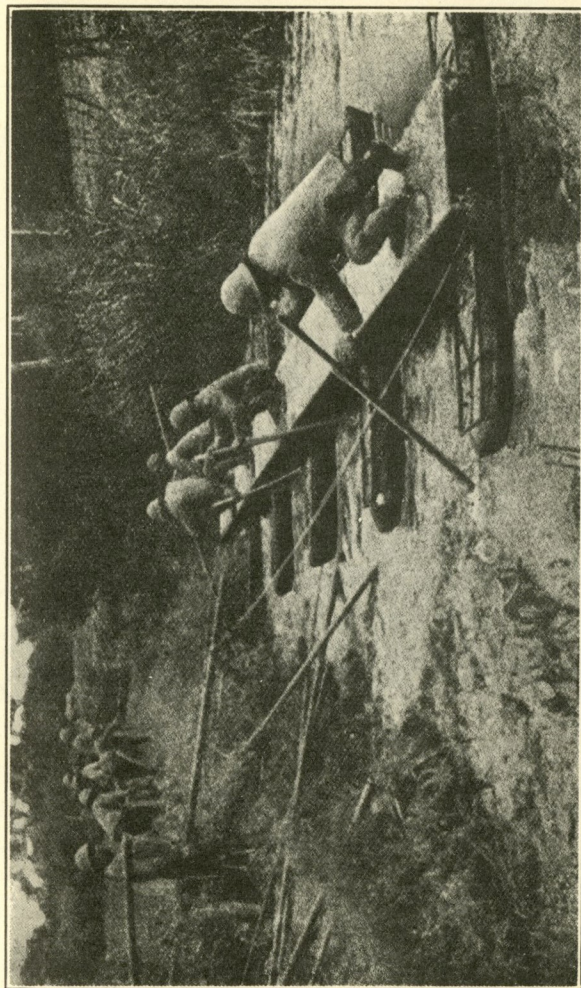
Bridging Equipment. Assault Bridging Equipment.
